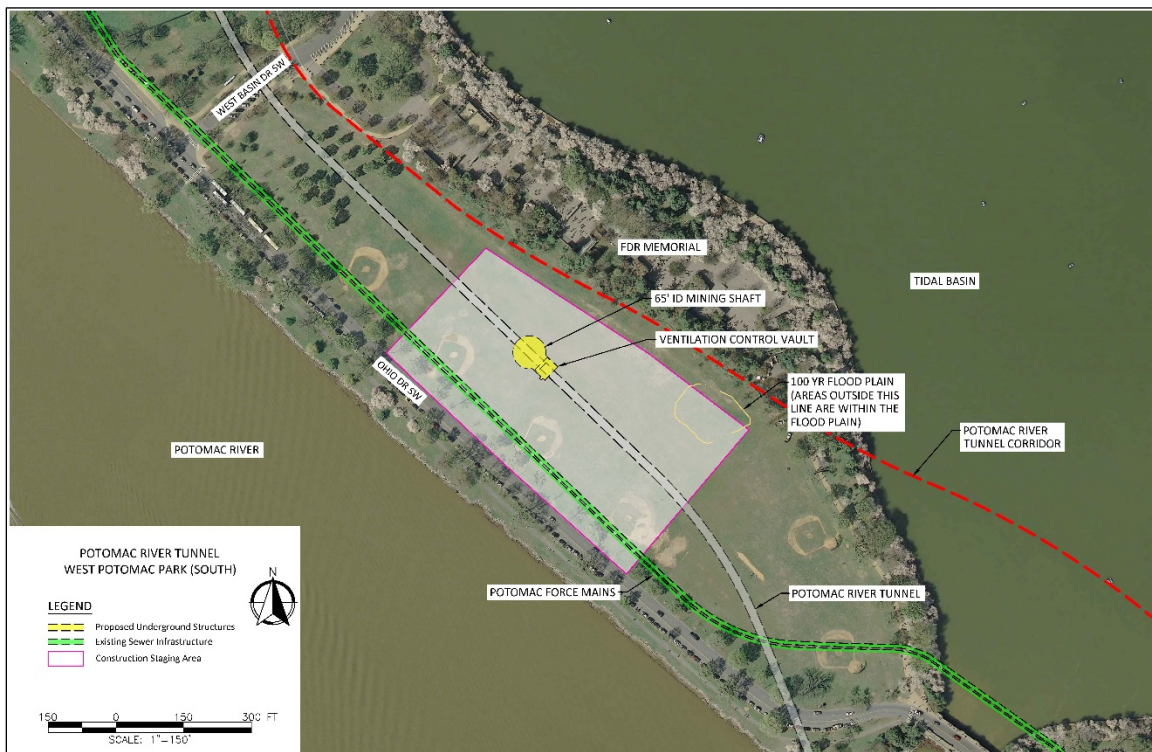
Tunnel Mining Site Option 2 – West Potomac Park (South)
